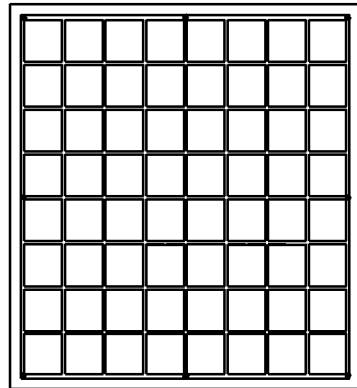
DETAIL WHEN USED ADJACENT TO CURB WITHOUT GUTTER
